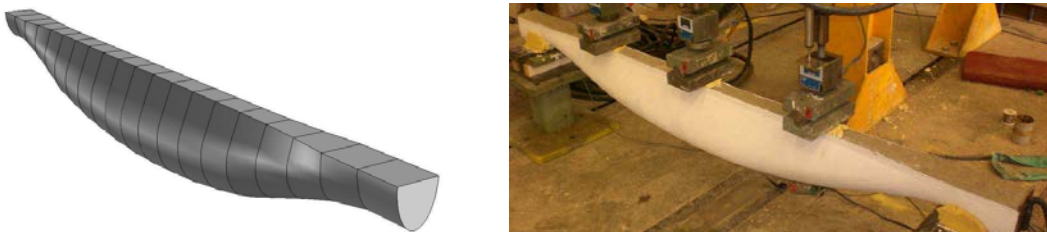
Fabric-formed beam test (Garbett, 2008)
